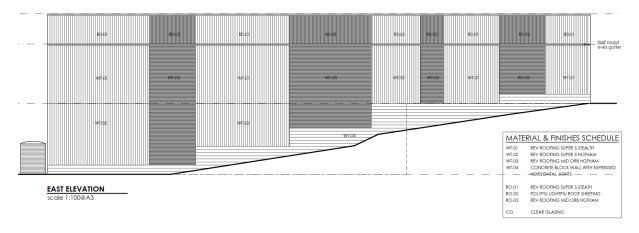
| Original proposal for Eastern Elevation (amended at request of Council)
